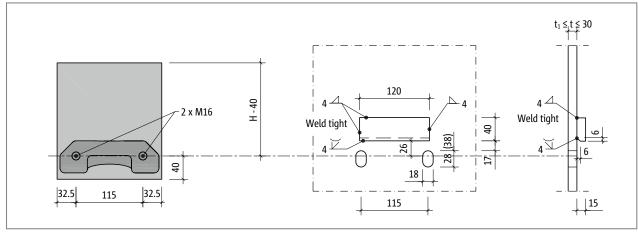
Schöck Isokorb® T type SQ: Design of the fixing plate connection
